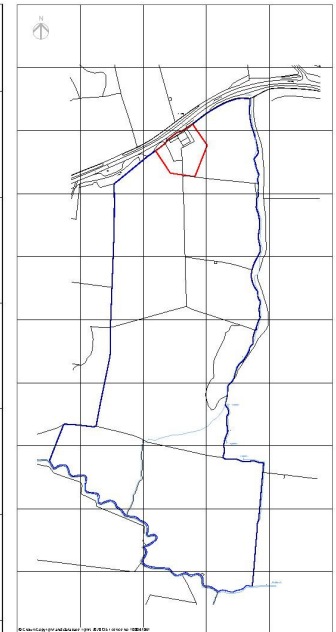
OS Location Plan. Red line boundary indicates proposed domestic curtilage of proposed dwelling. Blue line indicates whole site under applicant ownership
